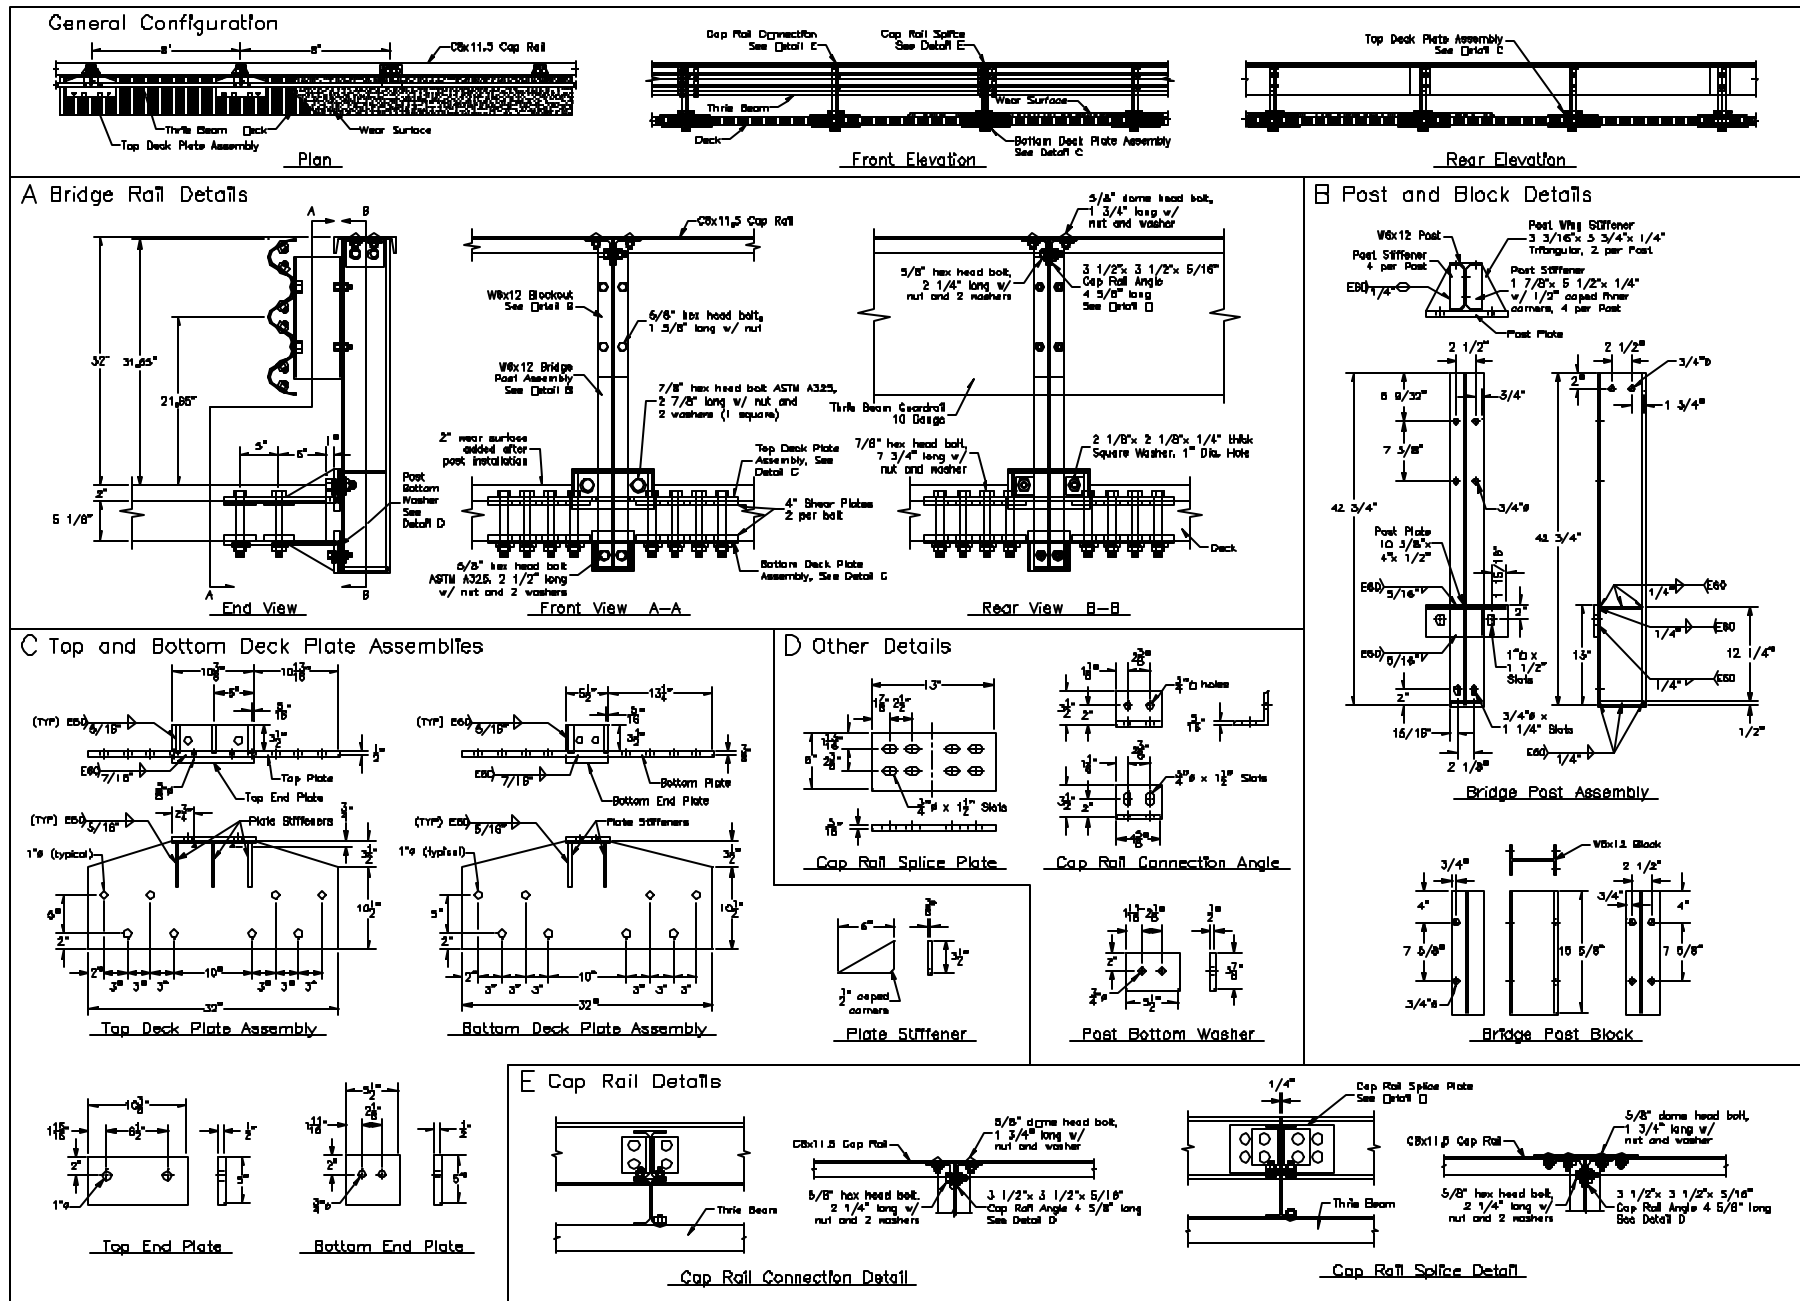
Steel Bridge Railing Design Details. System No. 1 (1 in. = 25.4 mm).
